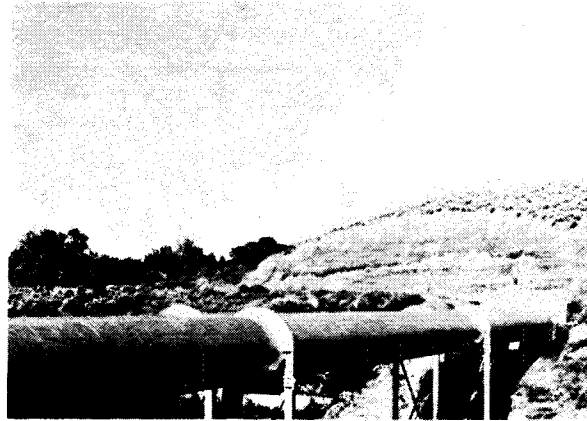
Overhead welded steel pipe crossing. P-31-D-22581
